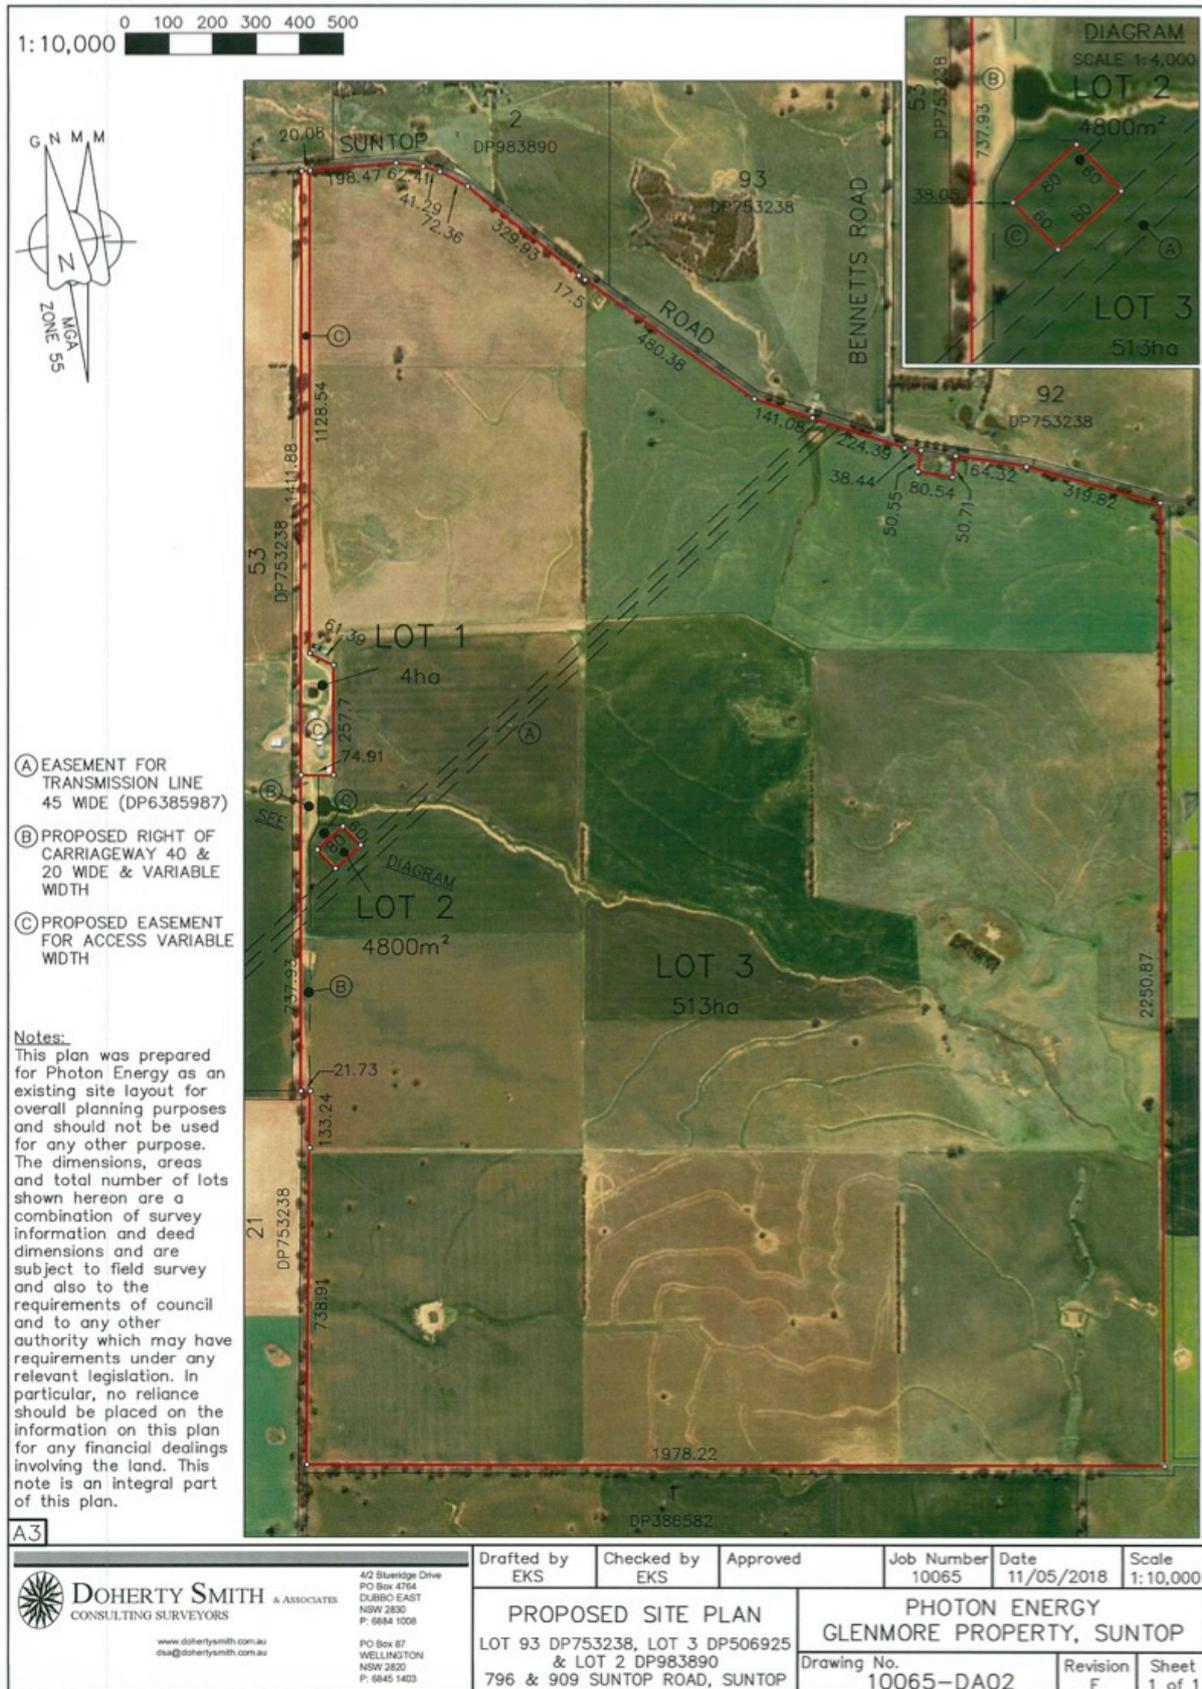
ORIGINAL SUBDIVISION LAYOUT (3 LOTS)
